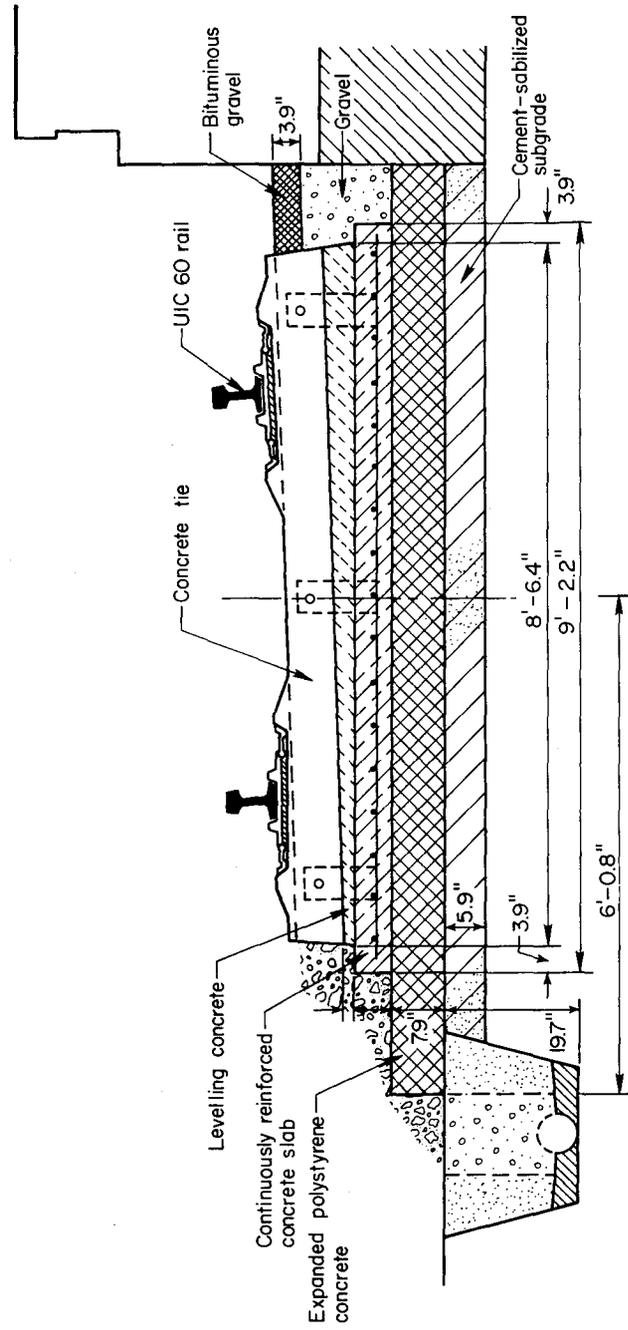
CROSS SECTION OF SLAB TRACK AT RHEDA
